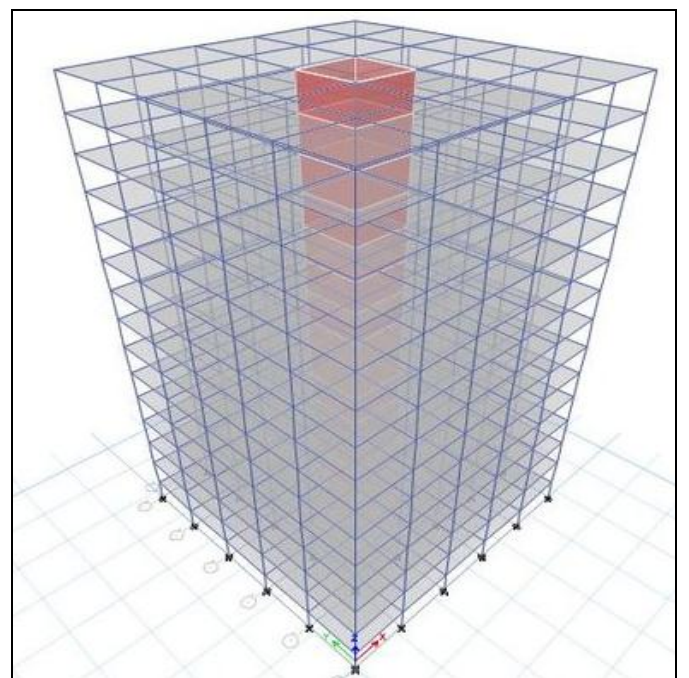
Multi storey building with RCC shear wall at the center of the geometry
